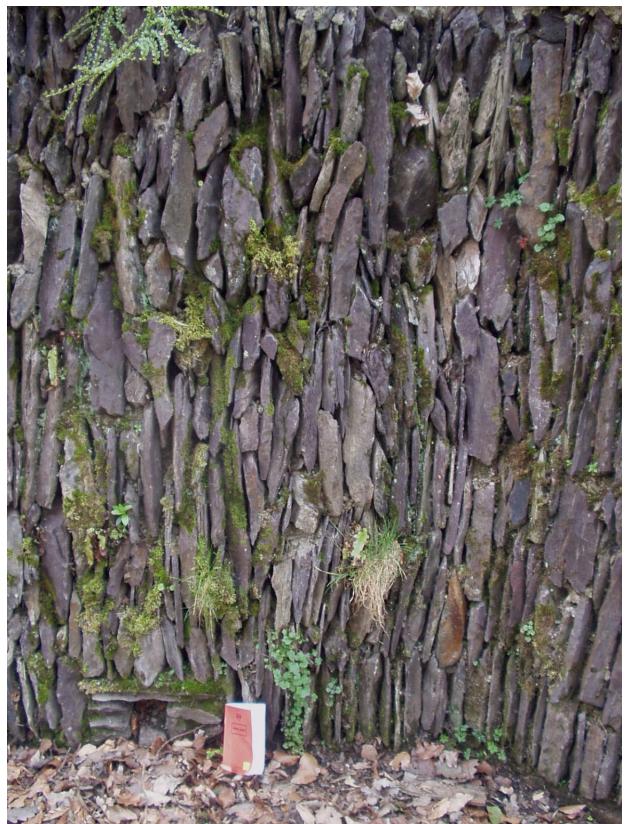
Cleaved sandstone with violet pigmentation, laid on edge; embankment to Northmoor Road, Near Dulverton.
